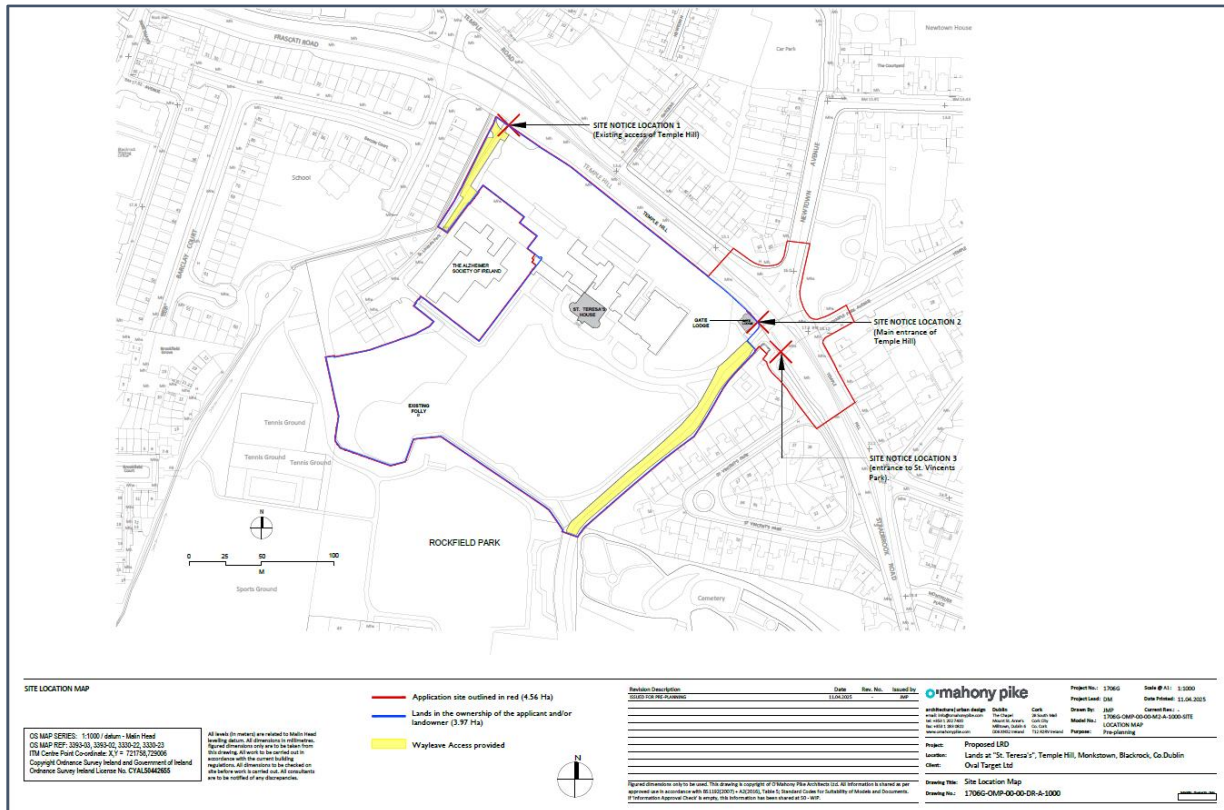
Site Location (O' Mahony Pike Architects, 2025)
